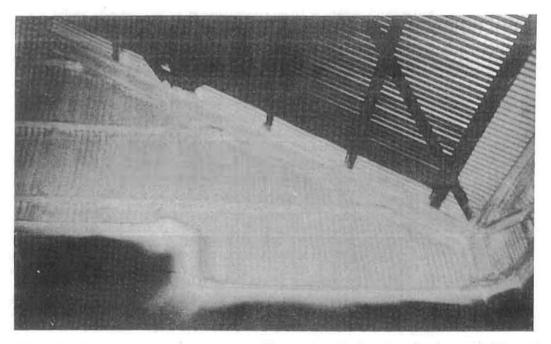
View of a gable end wall at the Meckering horizontal Silo after foaming of all joints and spray sealing of the finishing coat.
